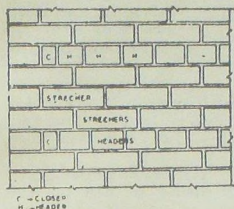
English Garden Wall bond. Fig. 190. Flemish Garden Wall bond.
